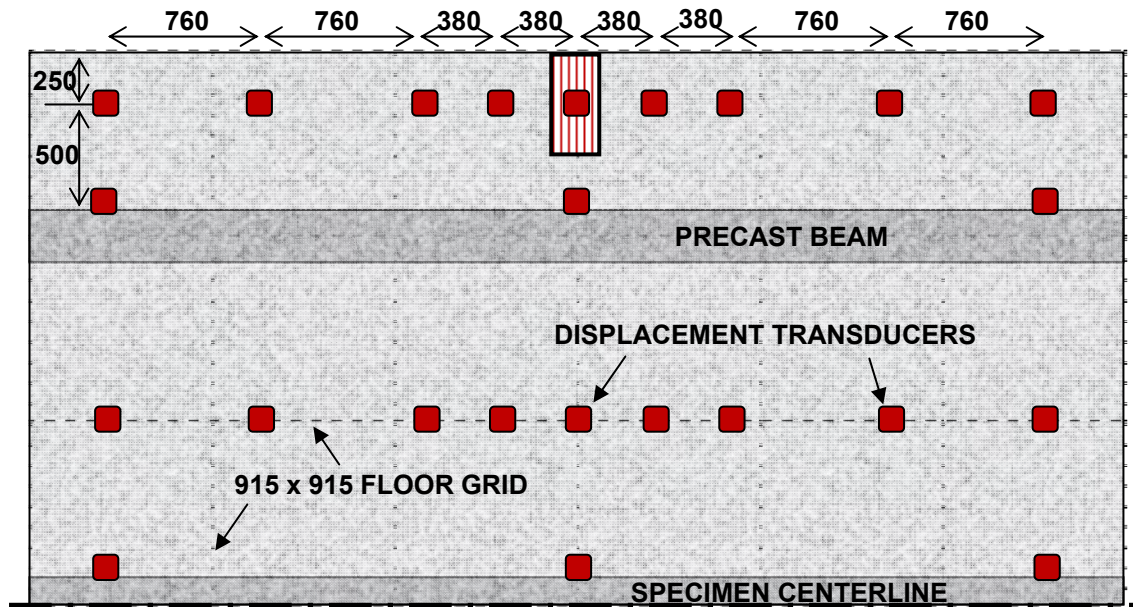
Plan view of Specimen 1 instrumentation for overhang failure load (dimensions in mm)
